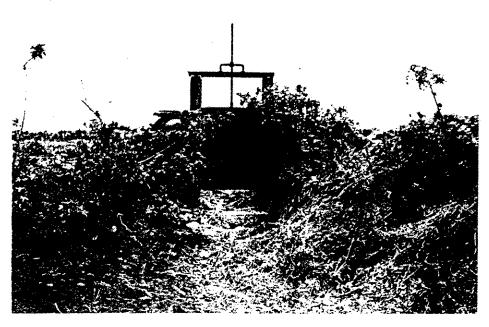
Site 50-50-04-572 Irrigation Ditch Sluice Gate in Northeast Portion of Project Area. Facing South
